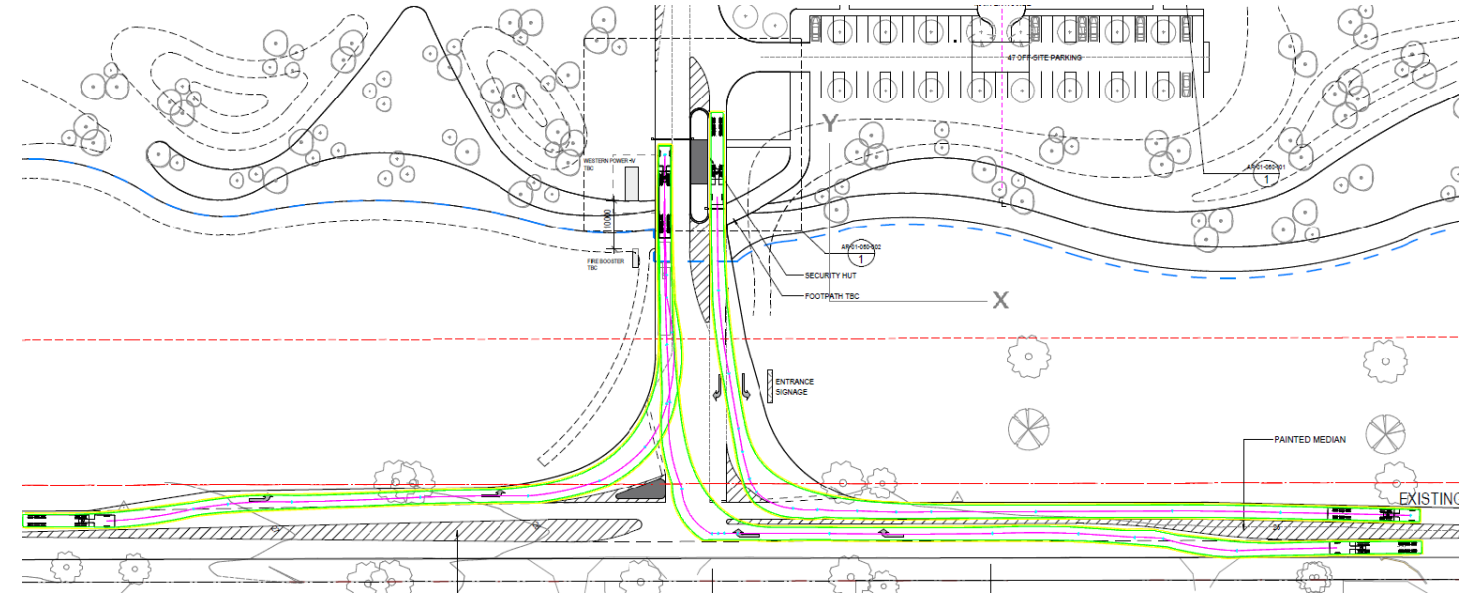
Service vehicle movements through the proposed interim site access with combined Malaga Site entry and exit road layout and existing single lane Marshall Road arrangement (source: Hassell, January 2023)
